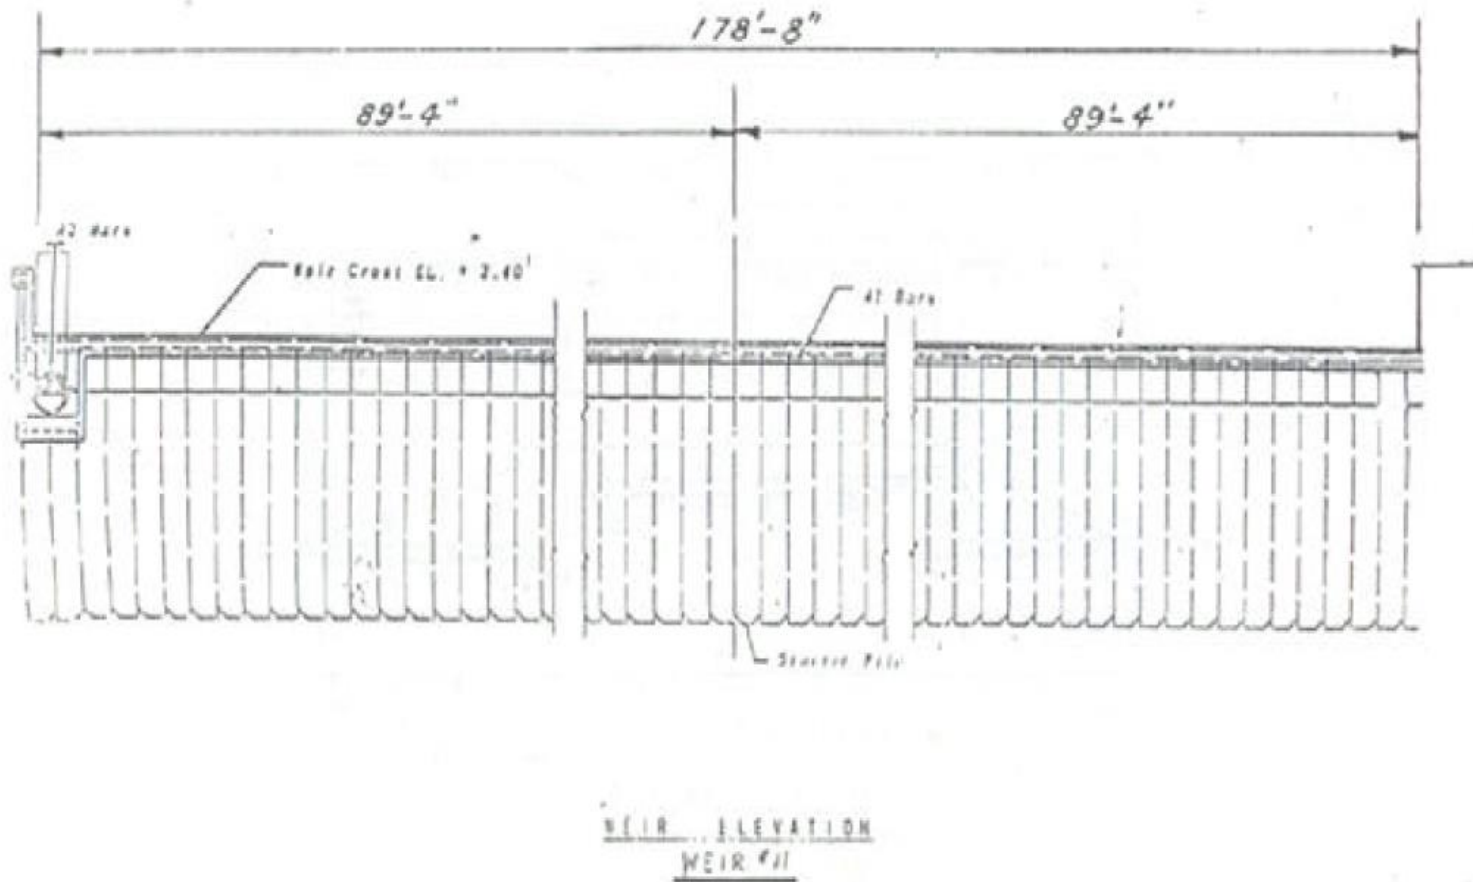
Sketch of the Weir Elevation (Source: Southern DataStream, Inc. and Boyle Engineering Corporation, 2001)
